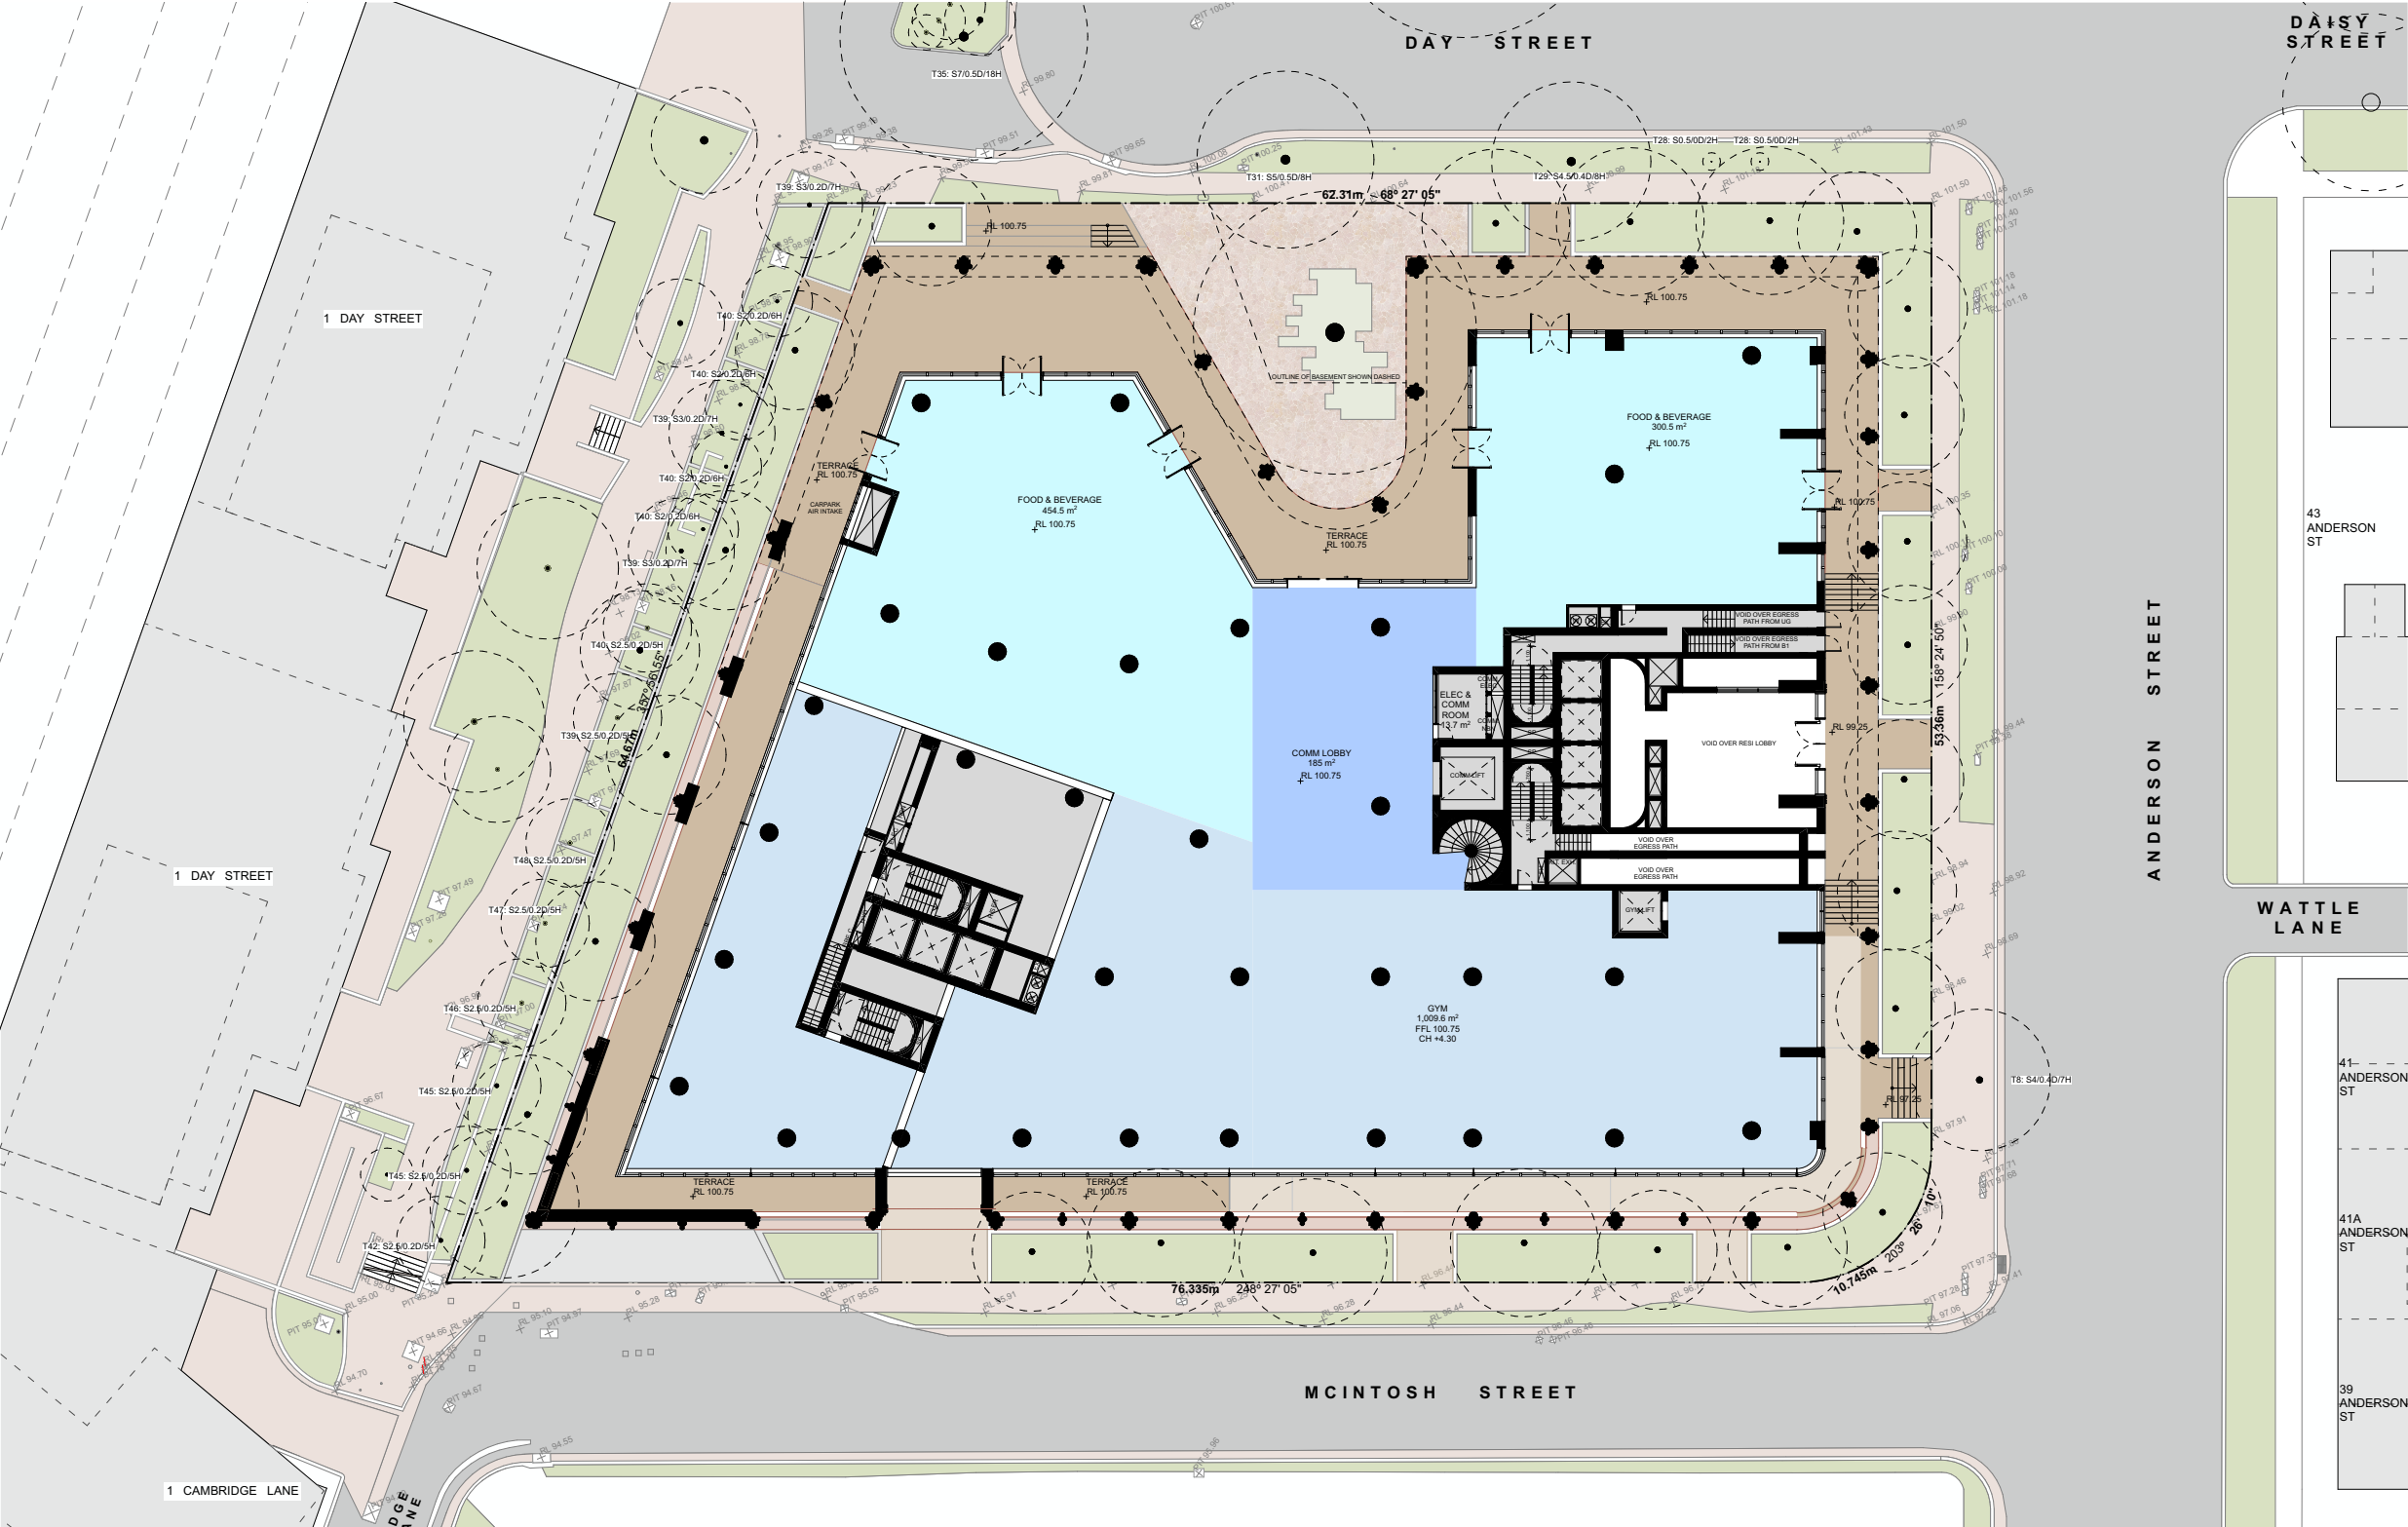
Plan view of Proposal at Upper Ground (Day St) level.
